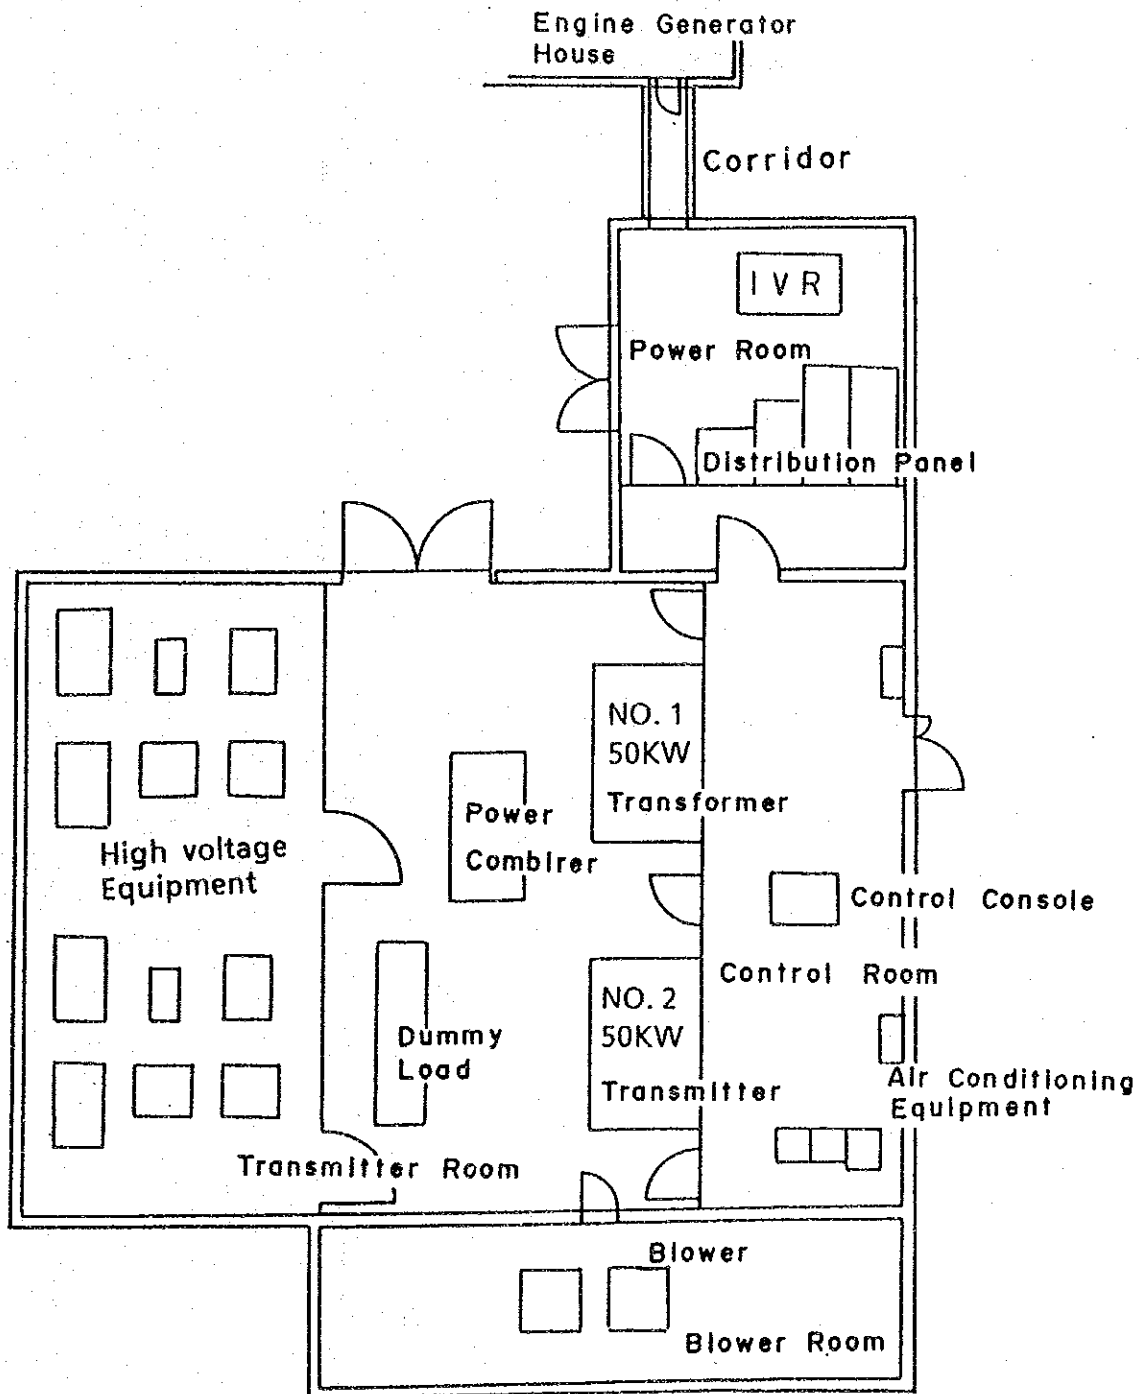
Layout of Equipment in New Transmitting Station Building
